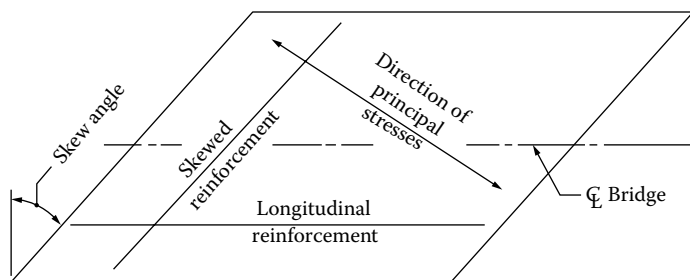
Reinforcement layout for skewed decks. (From *AASHTO LRFD Bridge Design Specifications*, Copyright © 2012 by American Association of State Highway and Transportation Officials, Washington, DC. Used by permission.)
